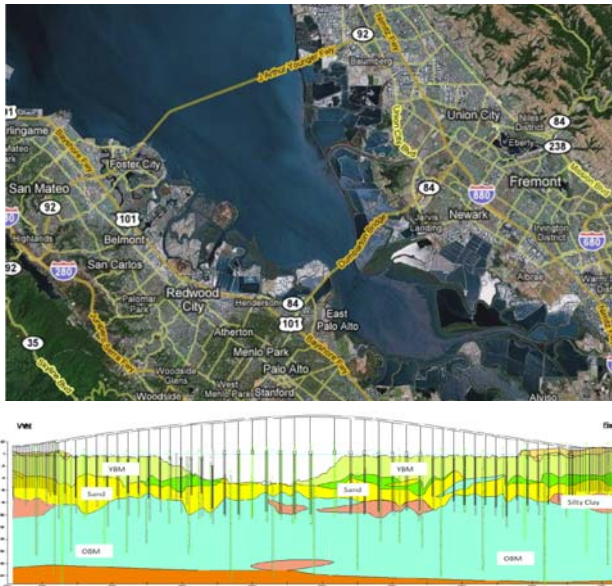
Dumbarton Bridge plan view (top), and longitudinal section along with idealized soil profile (bottom).
